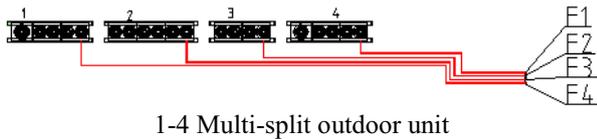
The conceptual drawing of outdoor units in the 4th floor roof
